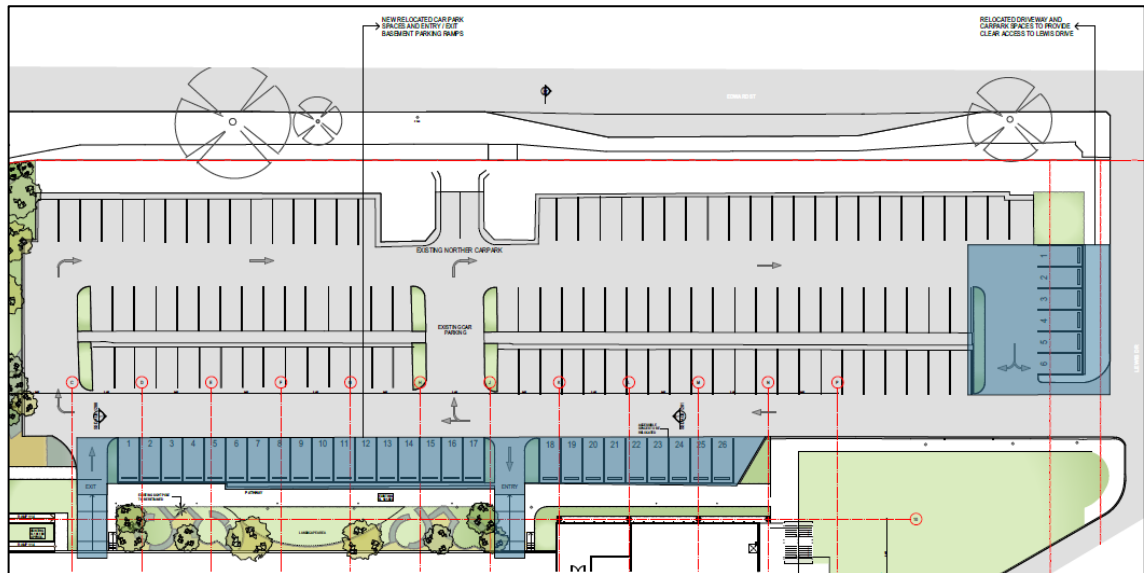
Proposed reinstated car parking spaces under existing demountable building (south of CP3)
